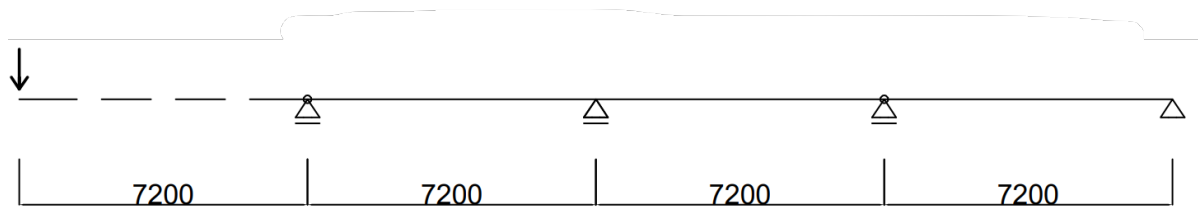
Corner column removed, double span beams supported by hinged connections, situation 1
